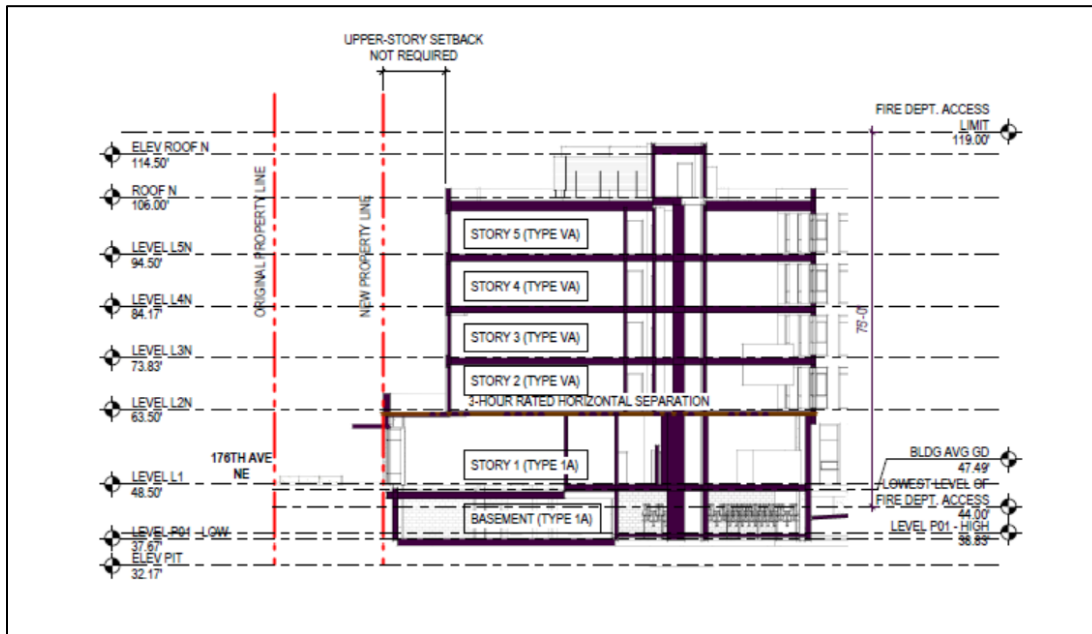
North building section from the architectural plans showing floor and elevator pit elevations.
